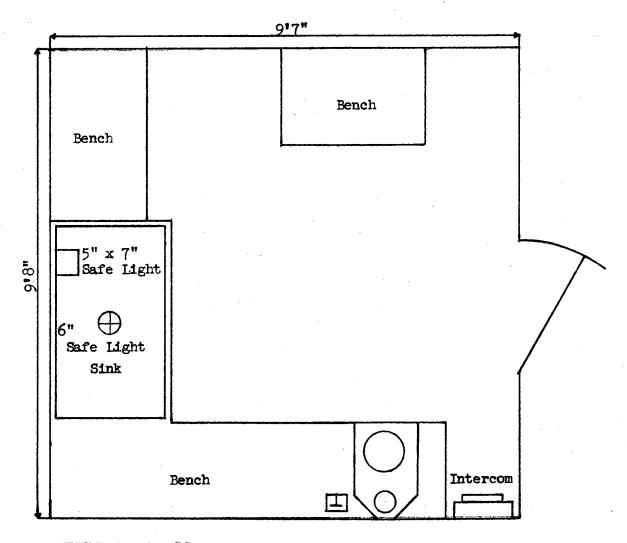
DARKROOM FLOOR PLAN - ENID DAILY EAGLE-MORNING NEWS. (SCALE 1/2" = 1")
